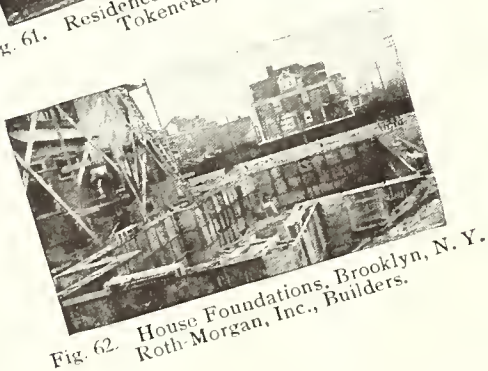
House Foundations, Brooklyn, N. Y. Roth-Morgan, Inc., Builders.
